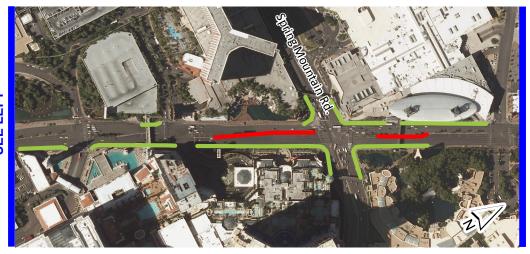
Back of Curb Elevated Landscaping Barrier.
